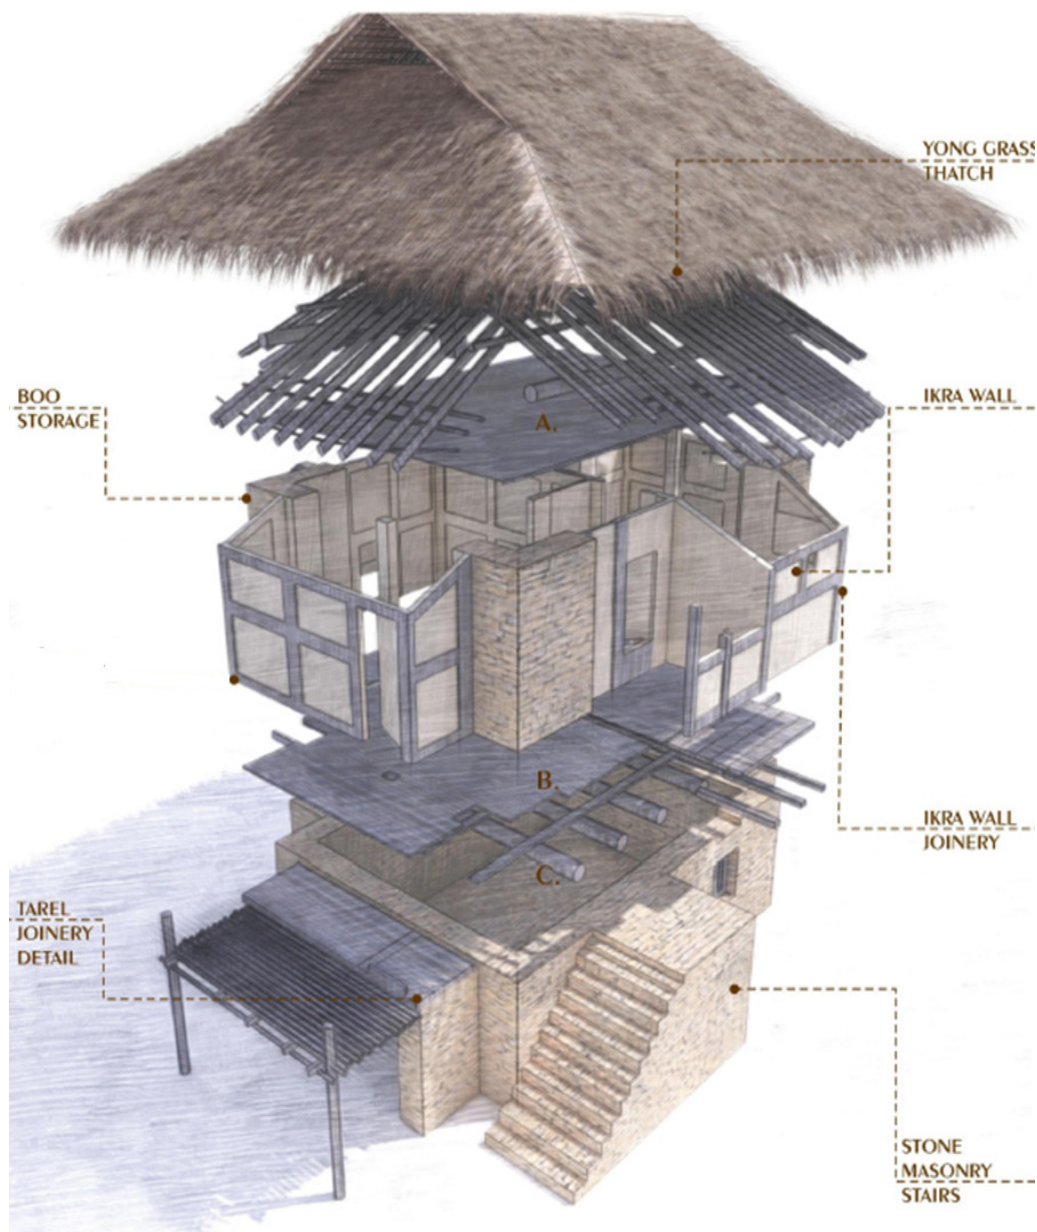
3D Model of Lepcha house of Renchenpong, Sikkim.
